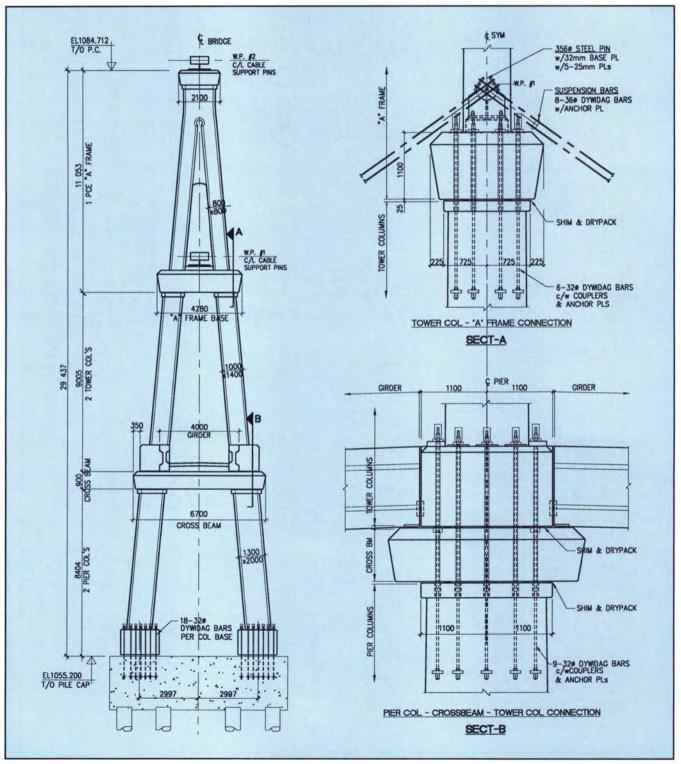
A-frame tower showing tower column and pier column cross-beam connections.
